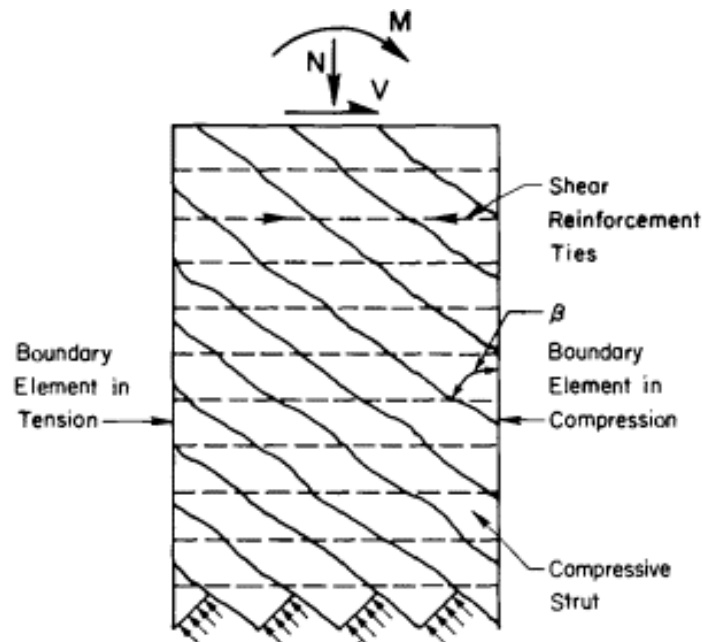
Truss analogy for masonry shear wall (adapted from Oesterle et al. 1984)
